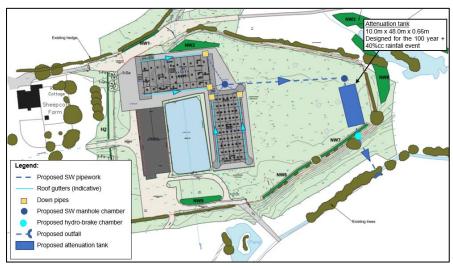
Layout of the proposed Surface Water Management Plan
